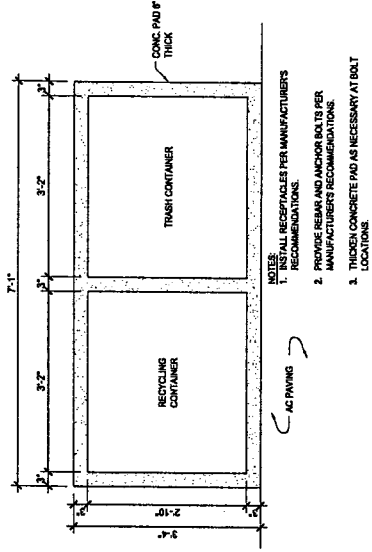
Sheet 8 of the Trail Construction Drawing Set
